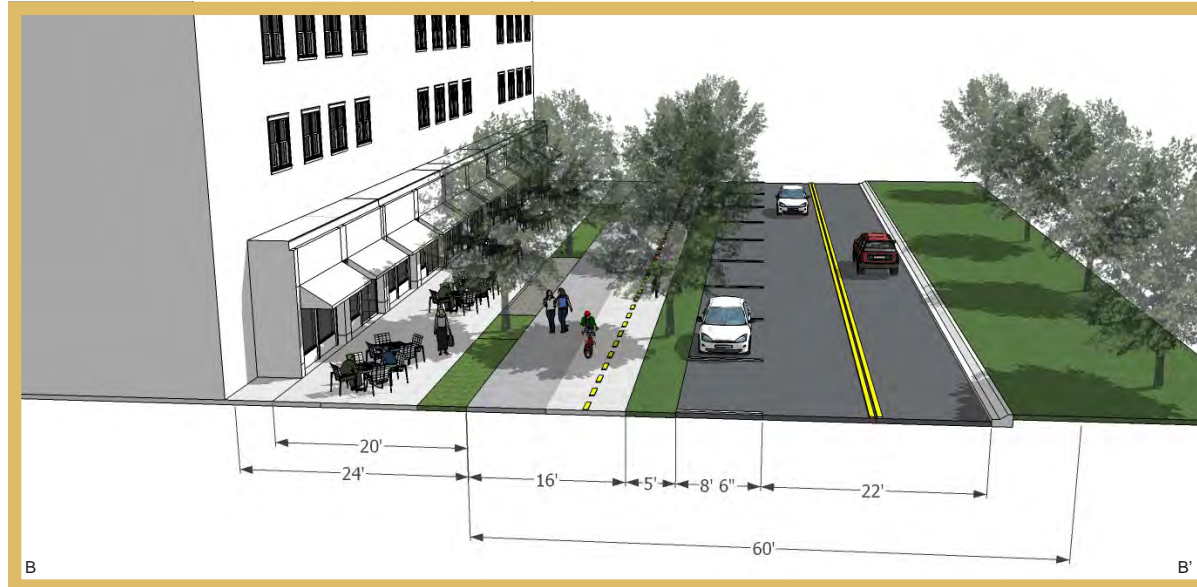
illustrates the proposed alignment of the Rail-Trail along Pierce Drive as a 16' wide multi-use separated trail. Additionally, a vegetative buffer with canopy trees and formal on-street parking will be added to the west side (left) of the street. This will be achieved by narrowing the traffic lanes from 15' to 11', which creates additional space for on-street parking and the vegetative buffer.
